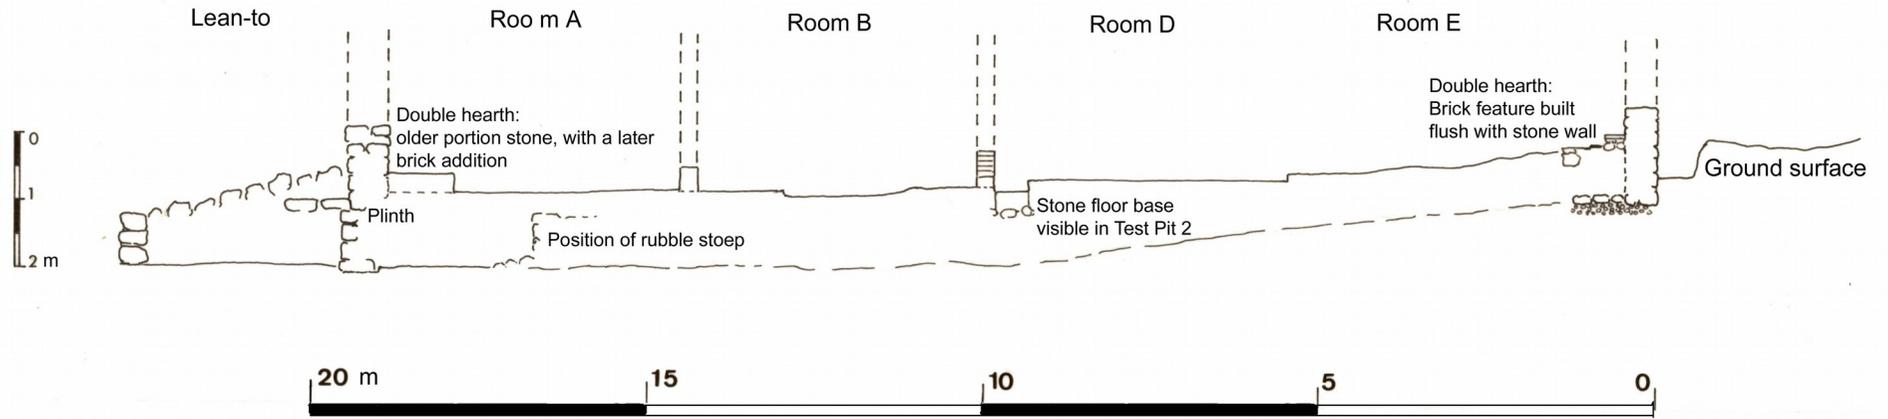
Skuifraam-1. Elevation of the western façade, drawn facing eastward.
